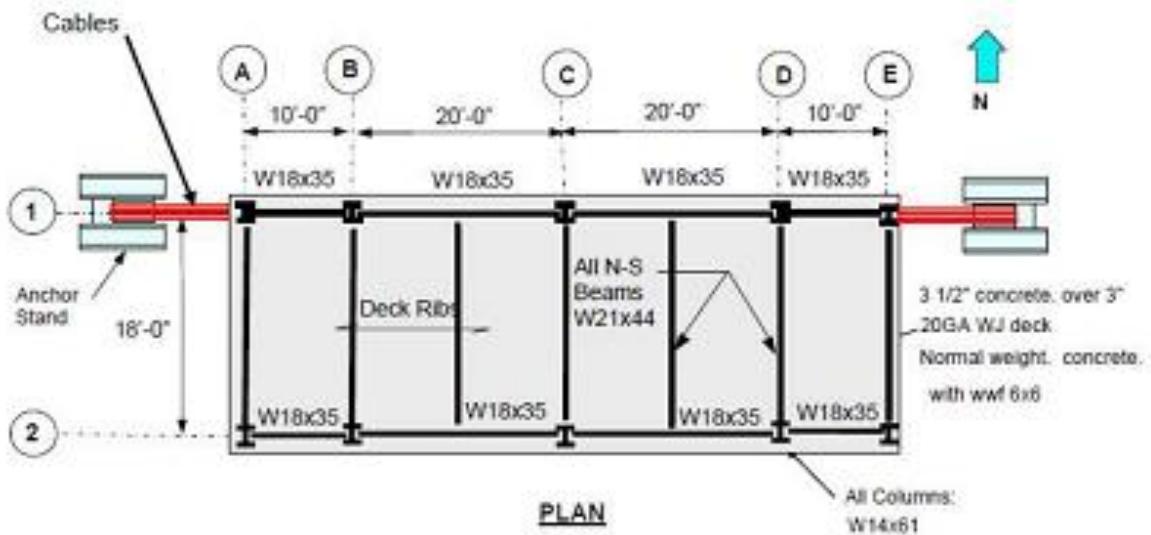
Plan view of the tested specimen with catenary cables (Astaneh-Asl 2007)
